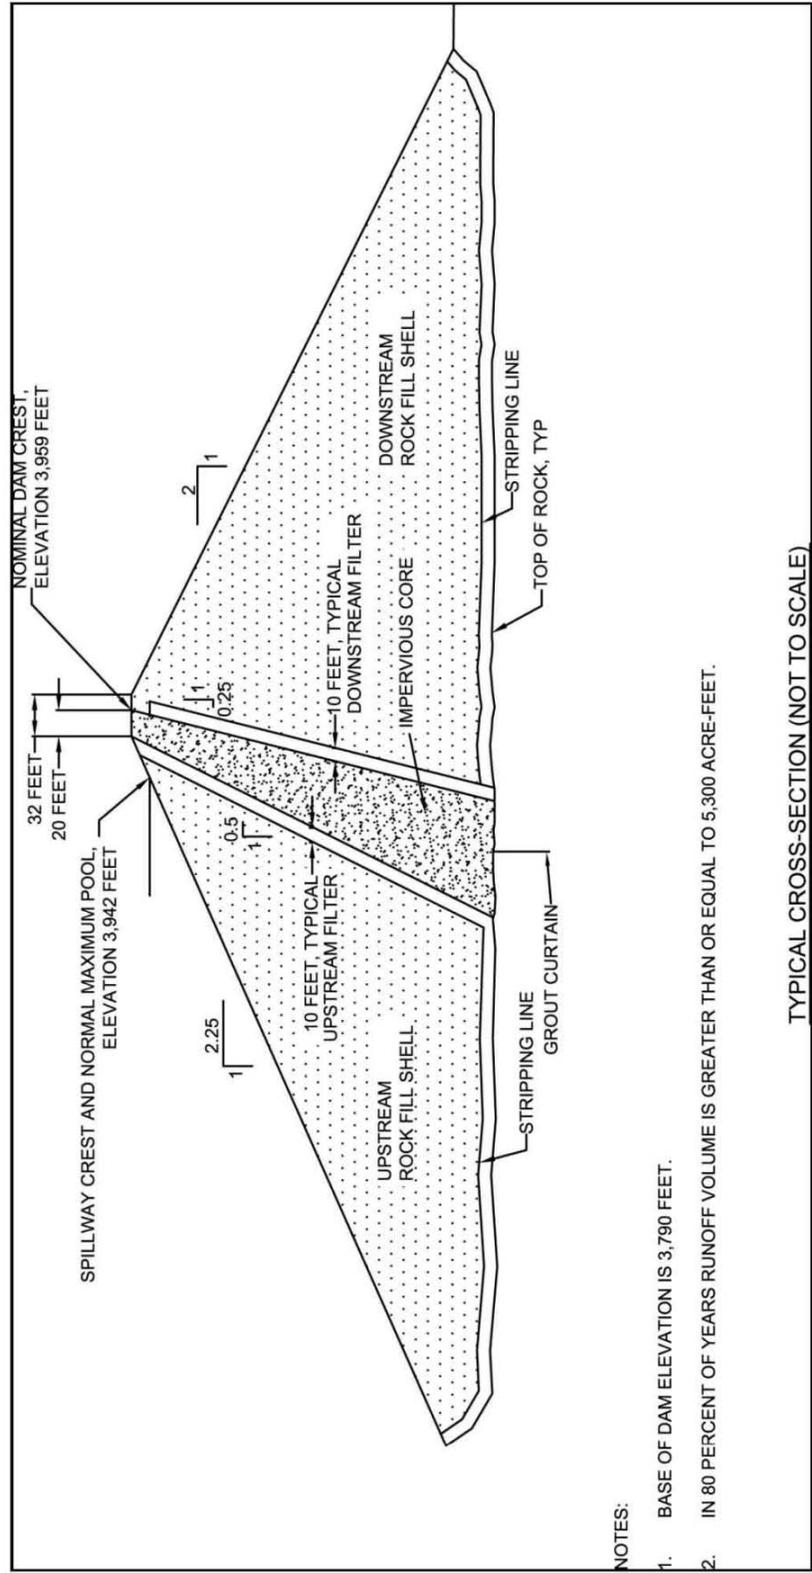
Proposed North Powder Reservoir Cross-Section
